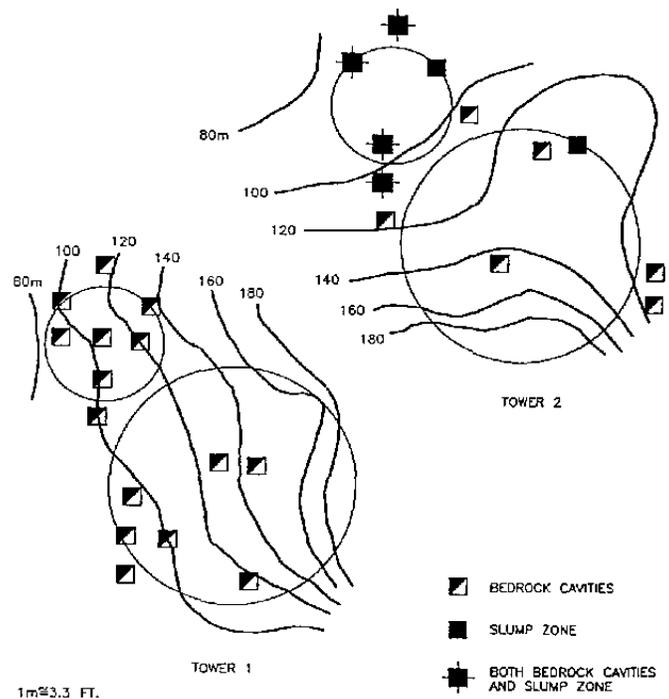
PLAN OF BEDROCK DEPTH CONTOURS AND GROUND IMPROVEMENT LOCATIONS
